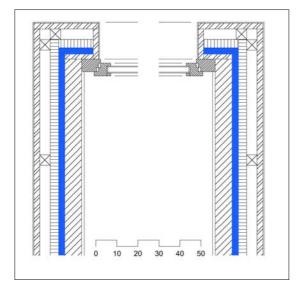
Vertical section through a prefabricated dormer window for the renovation of an old building
